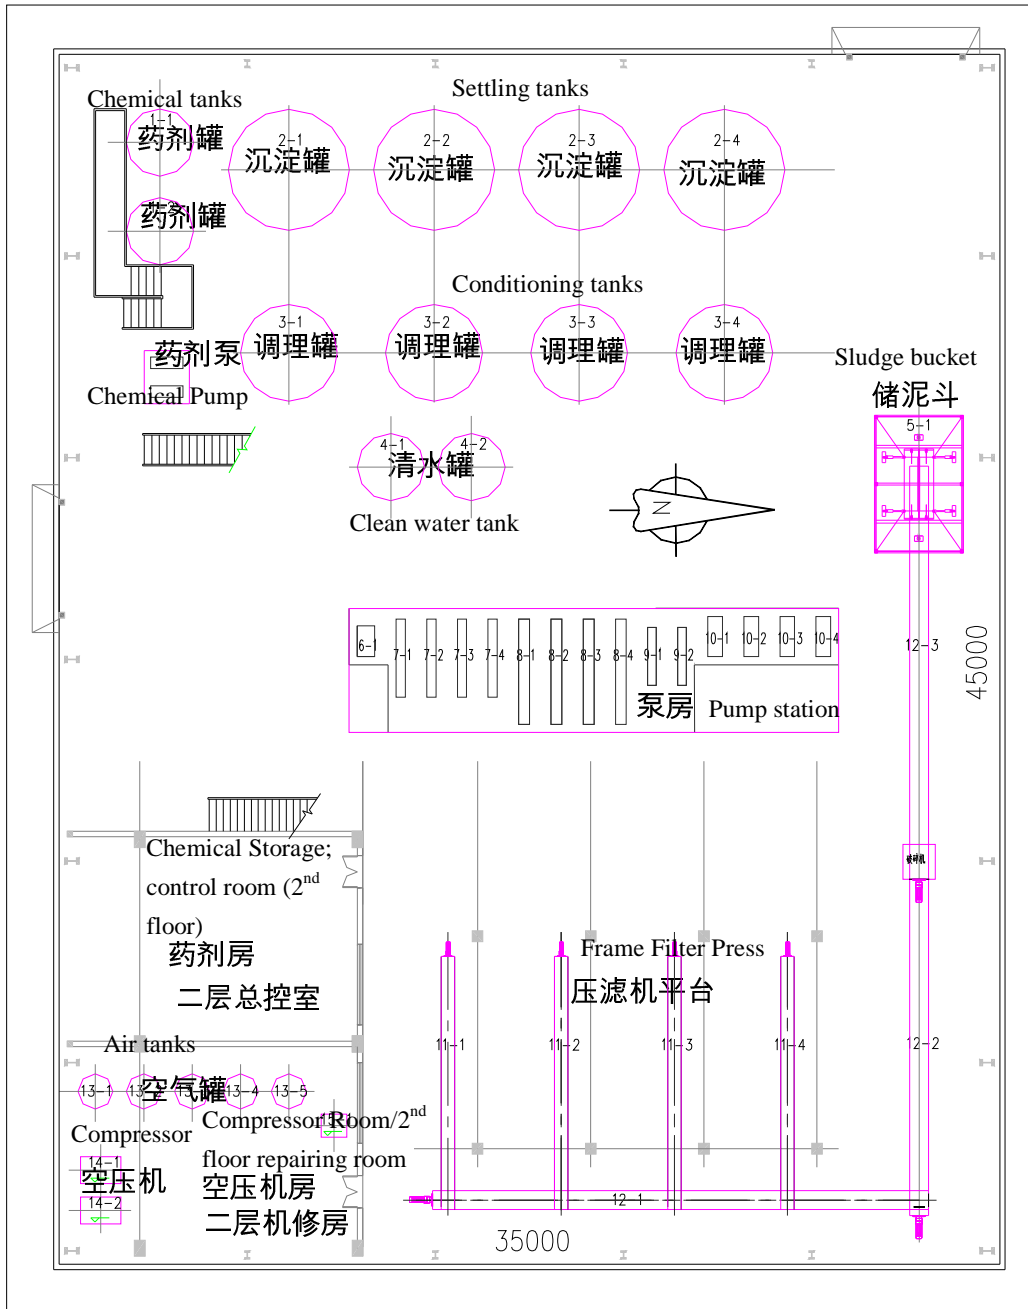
Layout of Zhen'an WWTP Sludge Dewatering Workshop (Scale1:260)
